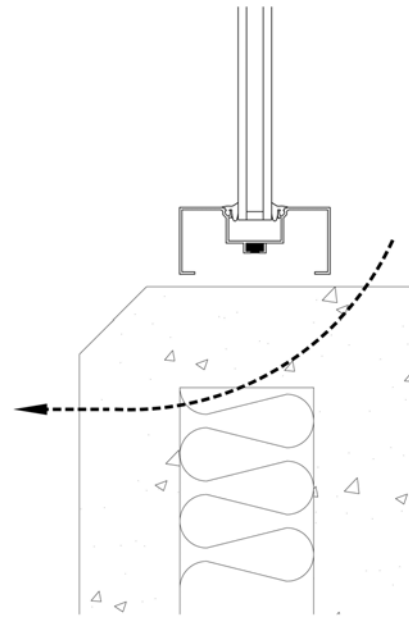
Insulated precast or tilt-up concrete panels.
